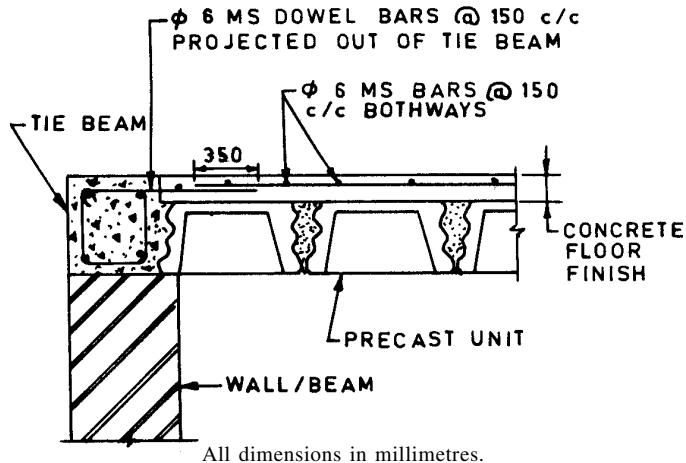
PROVISION OF REINFORCEMENT IN CONCRETE FLOOR FINISH
